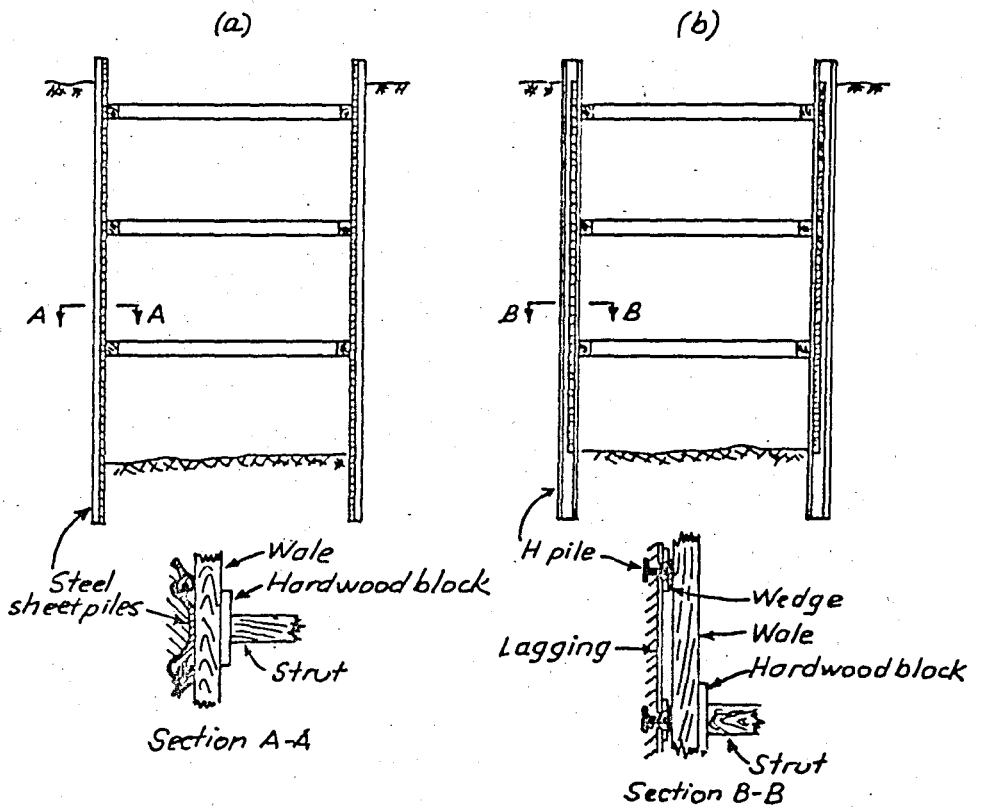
Cross Sections Through Typical Bracing in Deep Excavations. a-Sides Retained by Steel Sheet Piles. b-Sides Retained by H-Piles and Lagging (after Peck, 1974).
